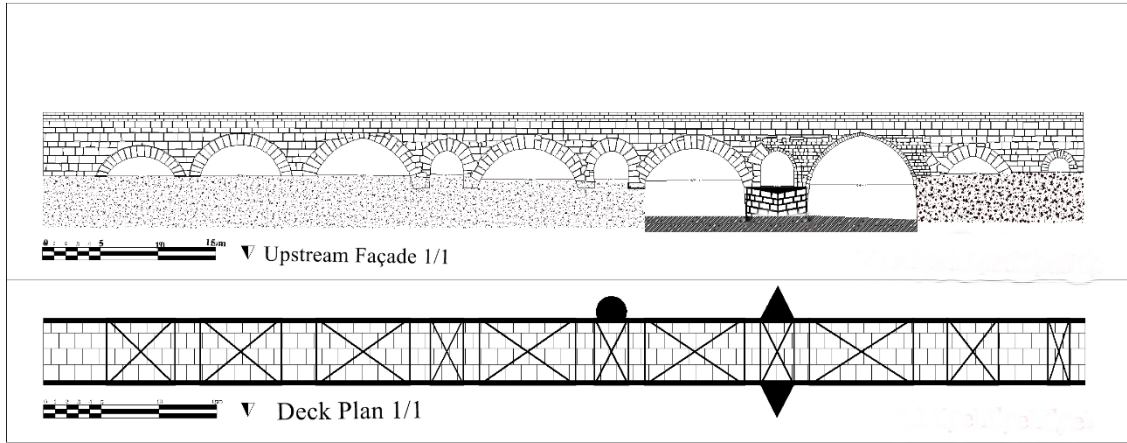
The Upstream Façade and the Deck Plan of the Bridge (Drawing: İ. Göçmen)
